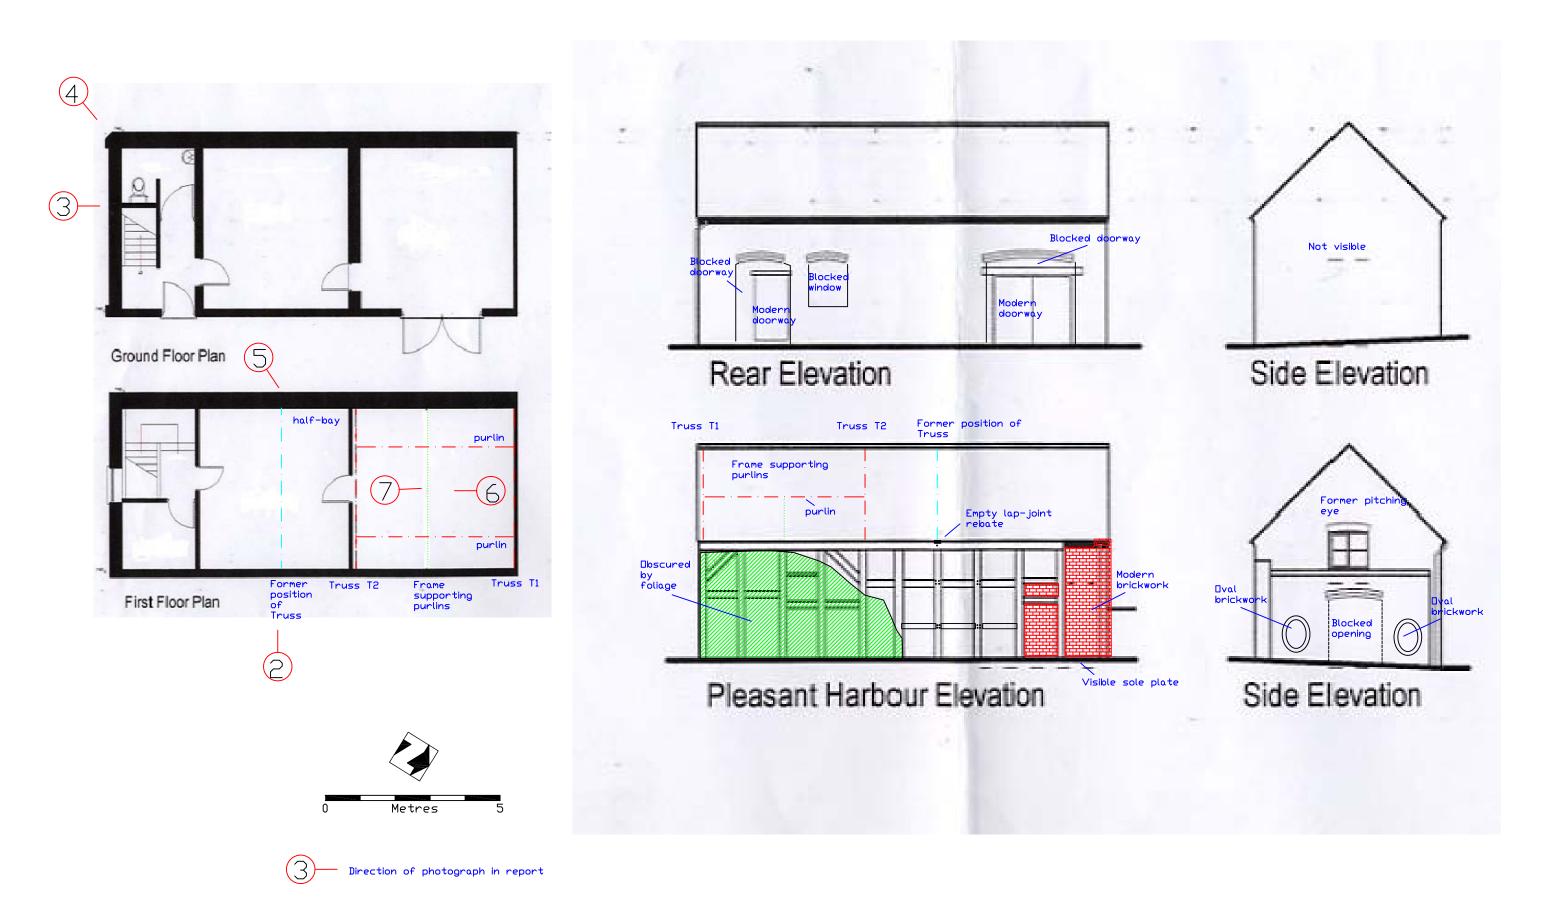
Plan and Elevations (based on survey drawings by Grace N. Plant & Associates)
